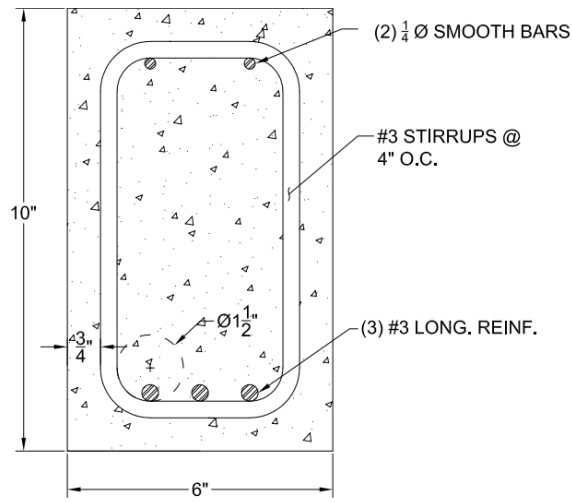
Concrete beam cross section showing steel reinforcement and dimensions.
